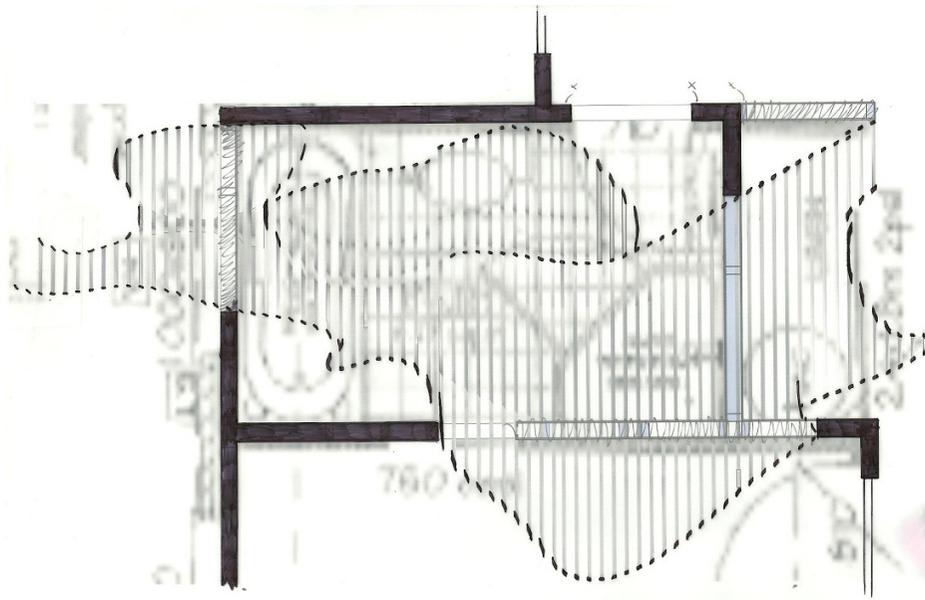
Plan view of bathroom design overlaid onto existing bathroom plan w/ alterations. Smith, L. (2011).
